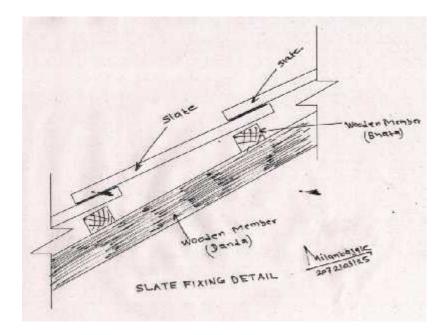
Slate fixing Detail (Sketch drawn on site, 2015)
